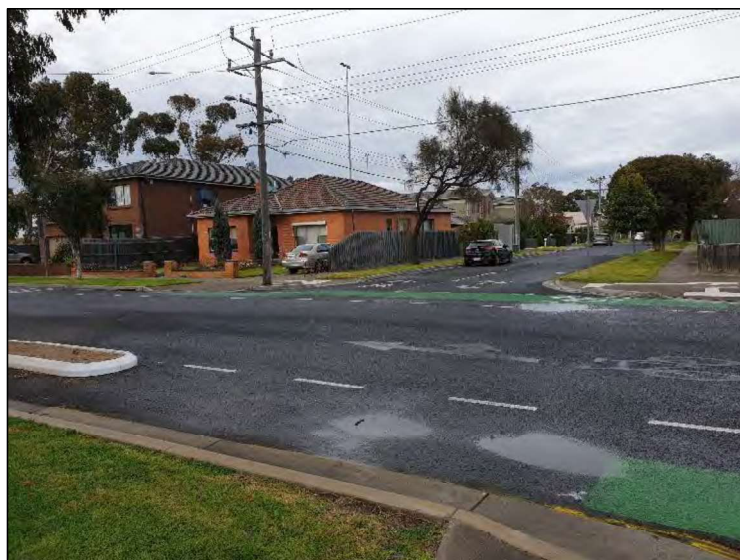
Valerie Street and Kent Road intersection – facing south towards Valerie Street
